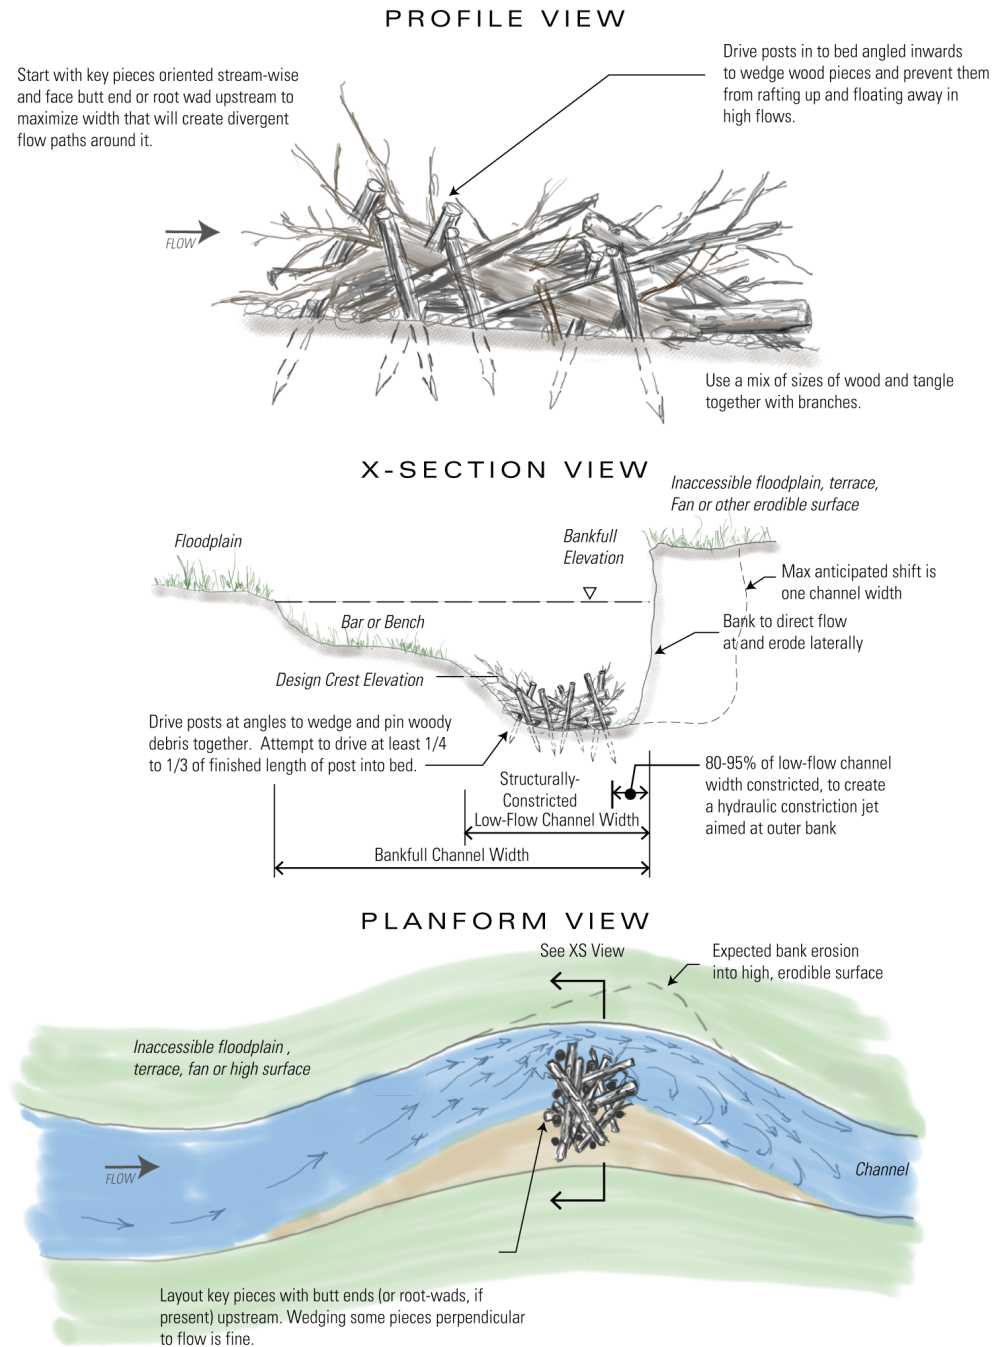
Drawing sketches of typical Beaver Dam Analog (BDA) structures including a profile, cross-section, and planform view.
